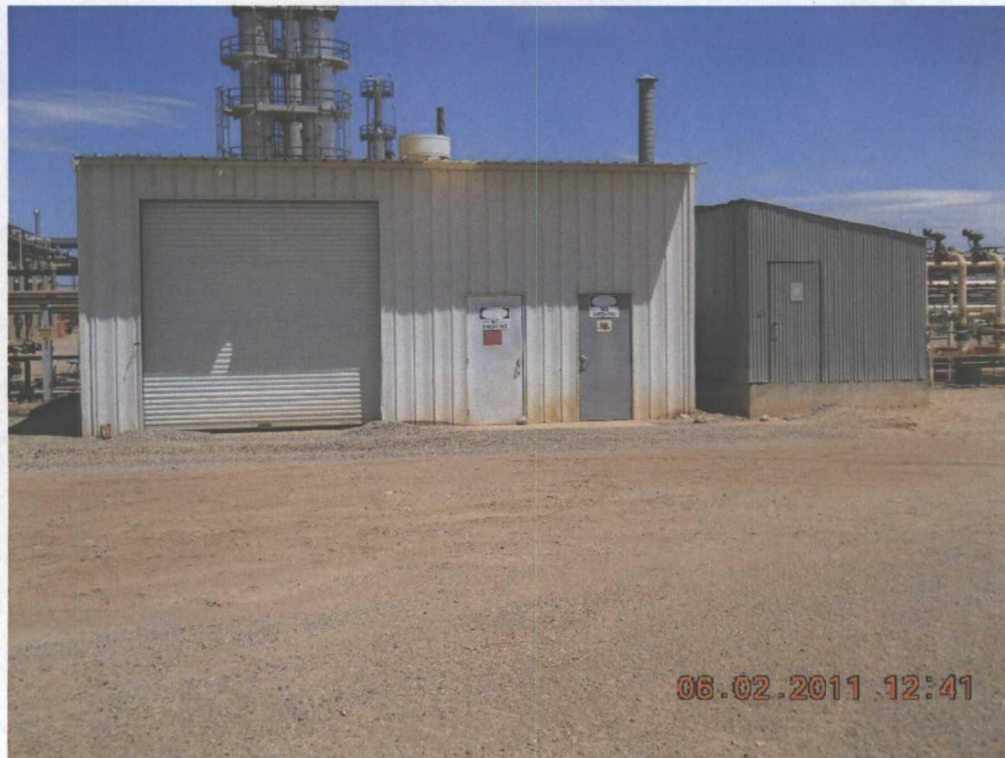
Looking north at buildings formerly associate with handling of tetraethyl lead.
